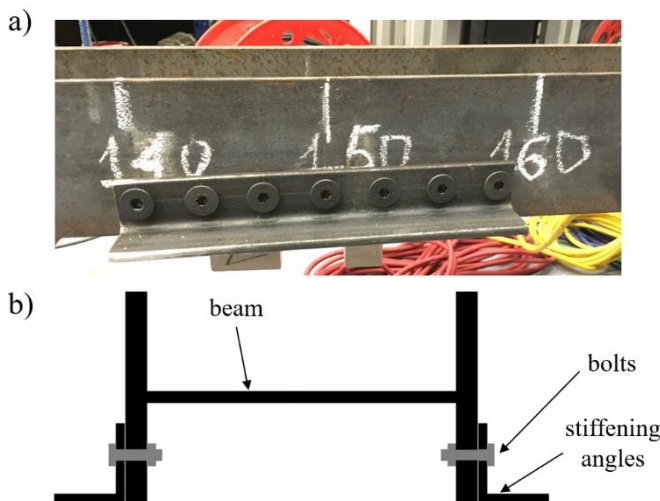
Beam stiffening detail, (a) Elevation view of the stiffening angles (b) Cross section of beam and stiffeners
